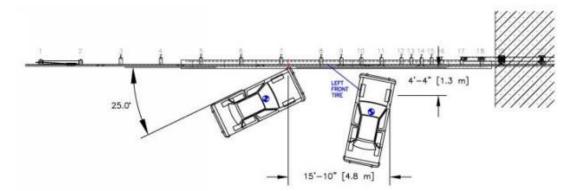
Test Impact Drawings for Test No. MWTC-1.
